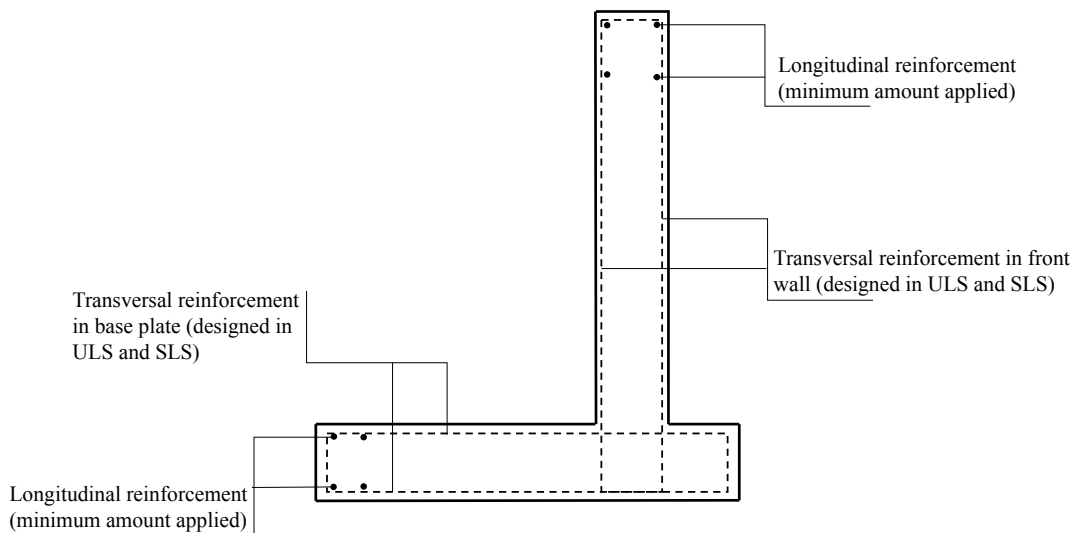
Schematic overview of the reinforcement layout of the retaining wall.
